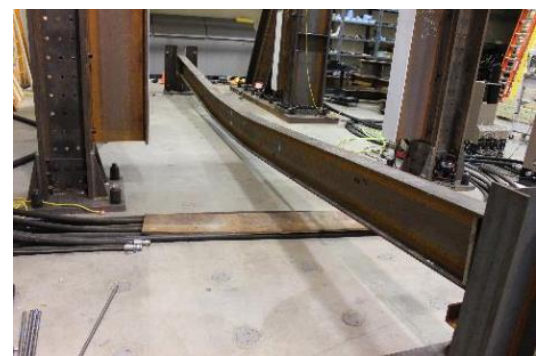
Deconstructed steel beam from specimen 1-m24-c2.
